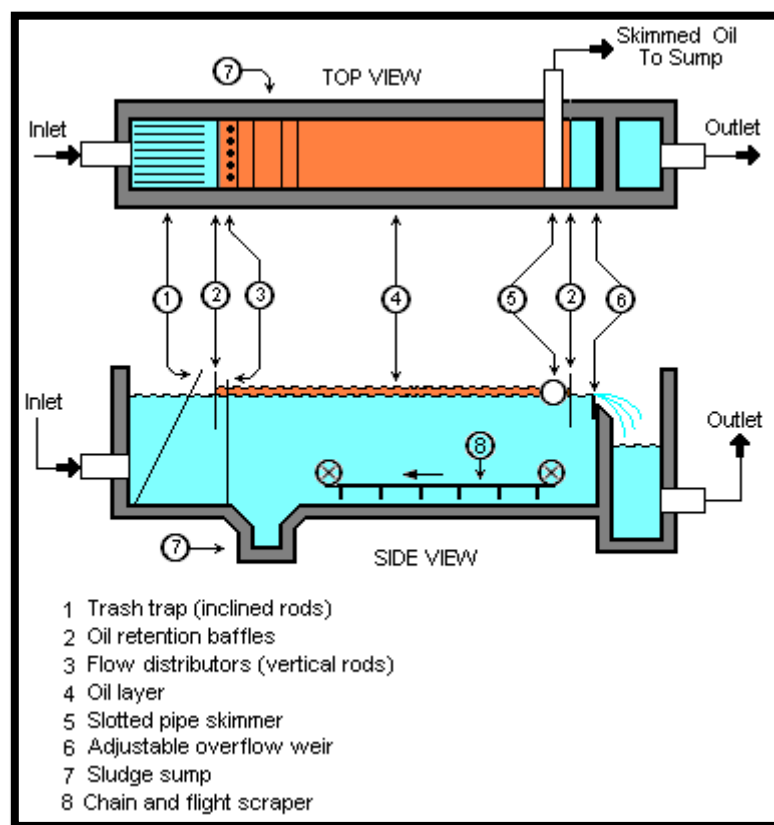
Typical oil trap (oil-water separator) system cross sectional design
